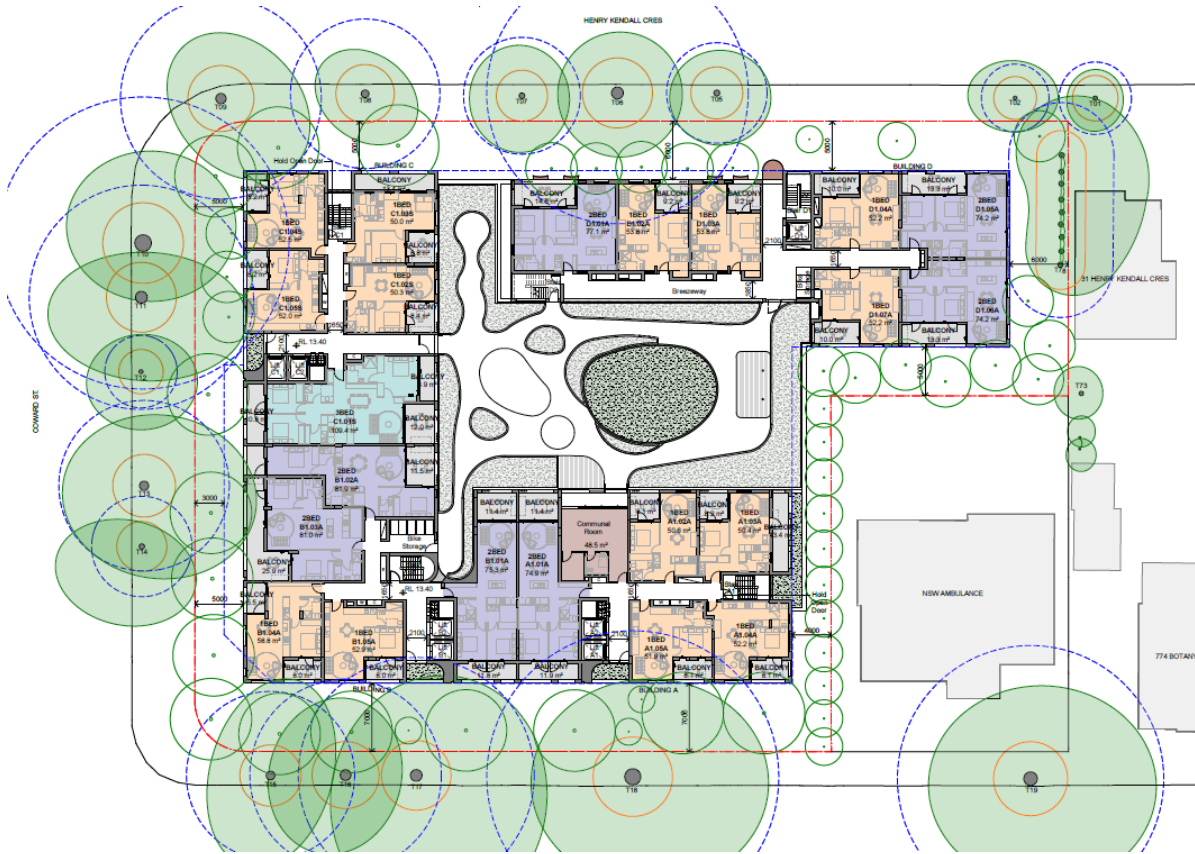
Floor Plan – Level 2 (indicative residential floor)
